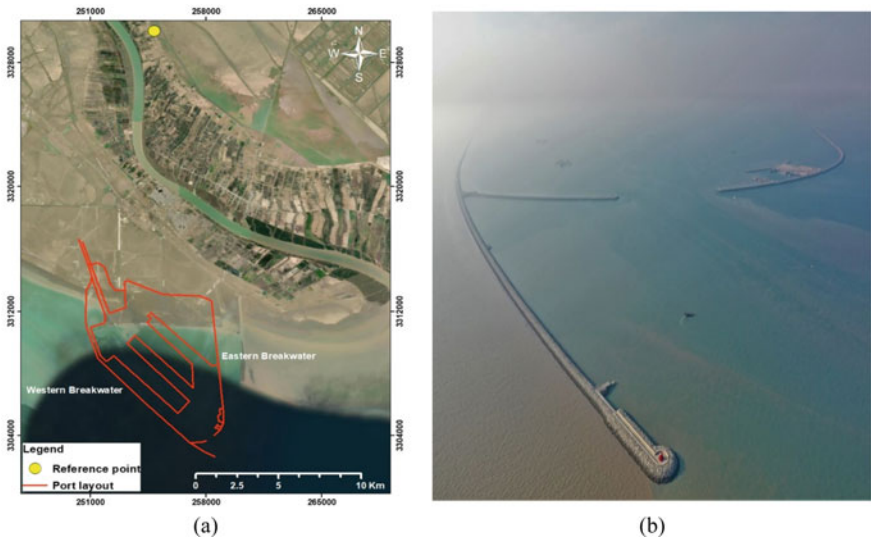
a New Al Faw port breakwaters layout [21]. b The construction of the western breakwater
